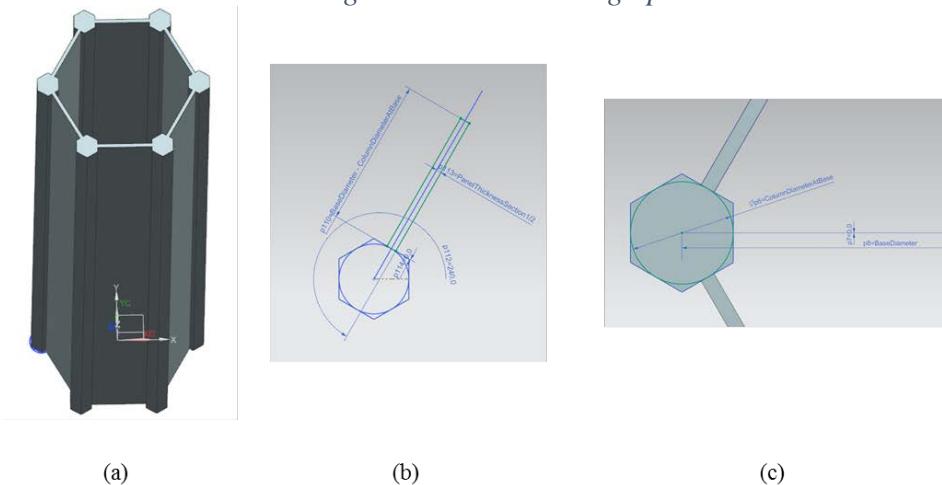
Parametric CAD model: (a) Example tower section (b and c) Design parameters encoded in CAD model
